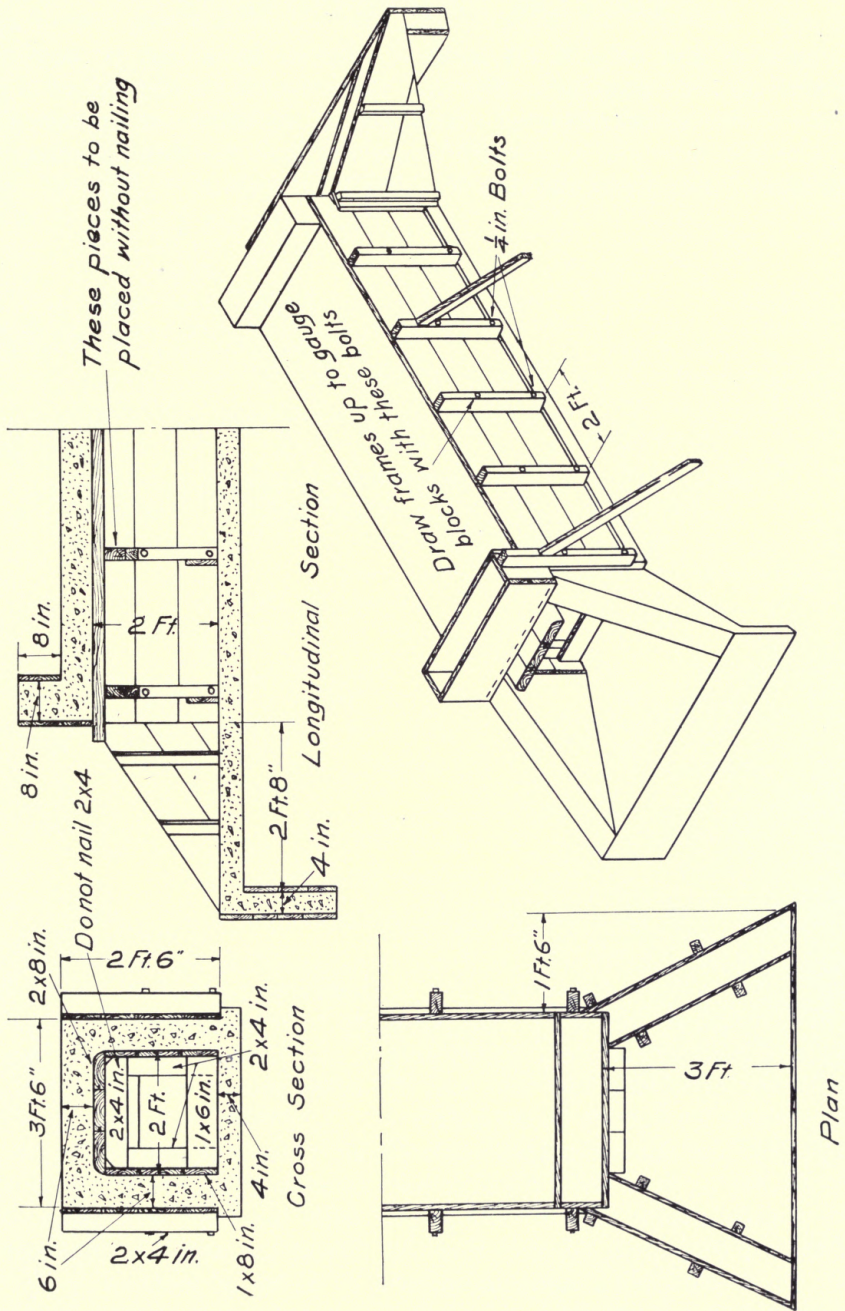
SMALL BOX CULVERT AND FORMS, IOWA STATE HIGHWAY COMMISSION.
